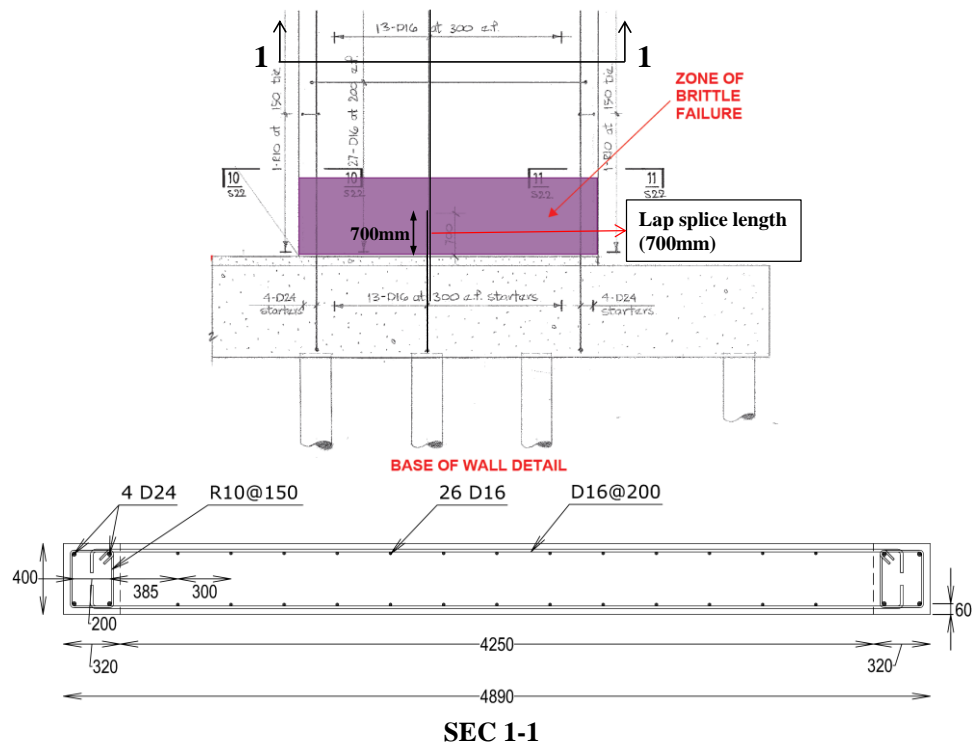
Details of the wall D 5-6 (Dunning Thornton 2011)
